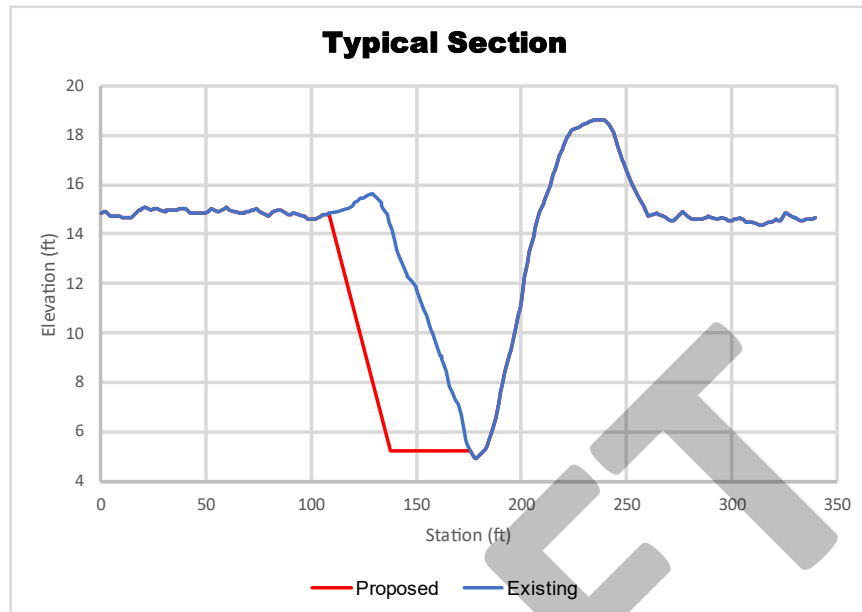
PEVITOT GULLY IMPROVEMENT SYSTEM TYPICAL SECTION
